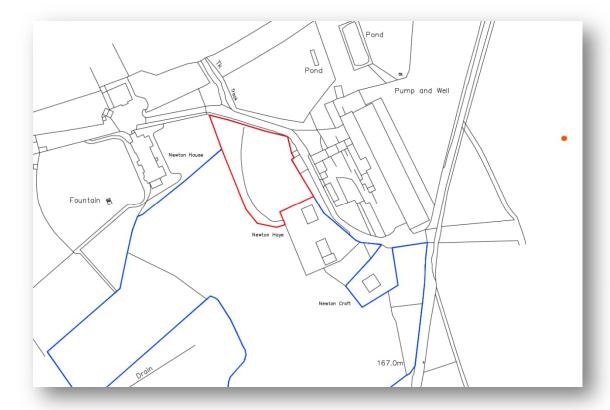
Proposed development red boundary outline (001 Site Location Plan.pdf)
